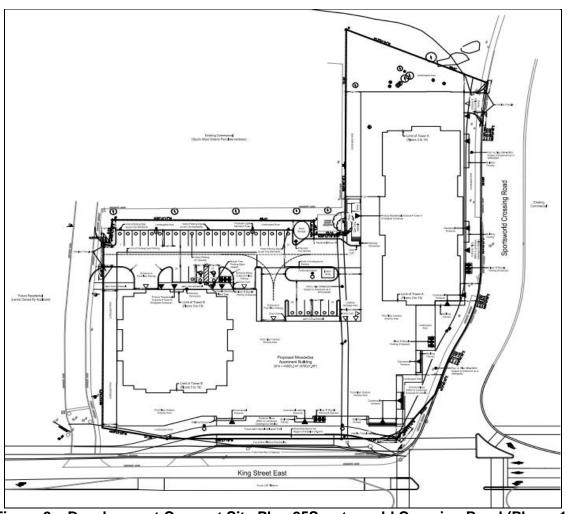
Development Concept Site Plan 25Sportsworld Crossing Road (Phase 1)
